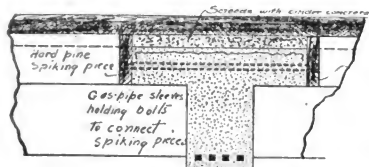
DETAIL SECTION OF T-BEAM SHOWING SPIKING PIECES AND TIMBER FLOORING.
